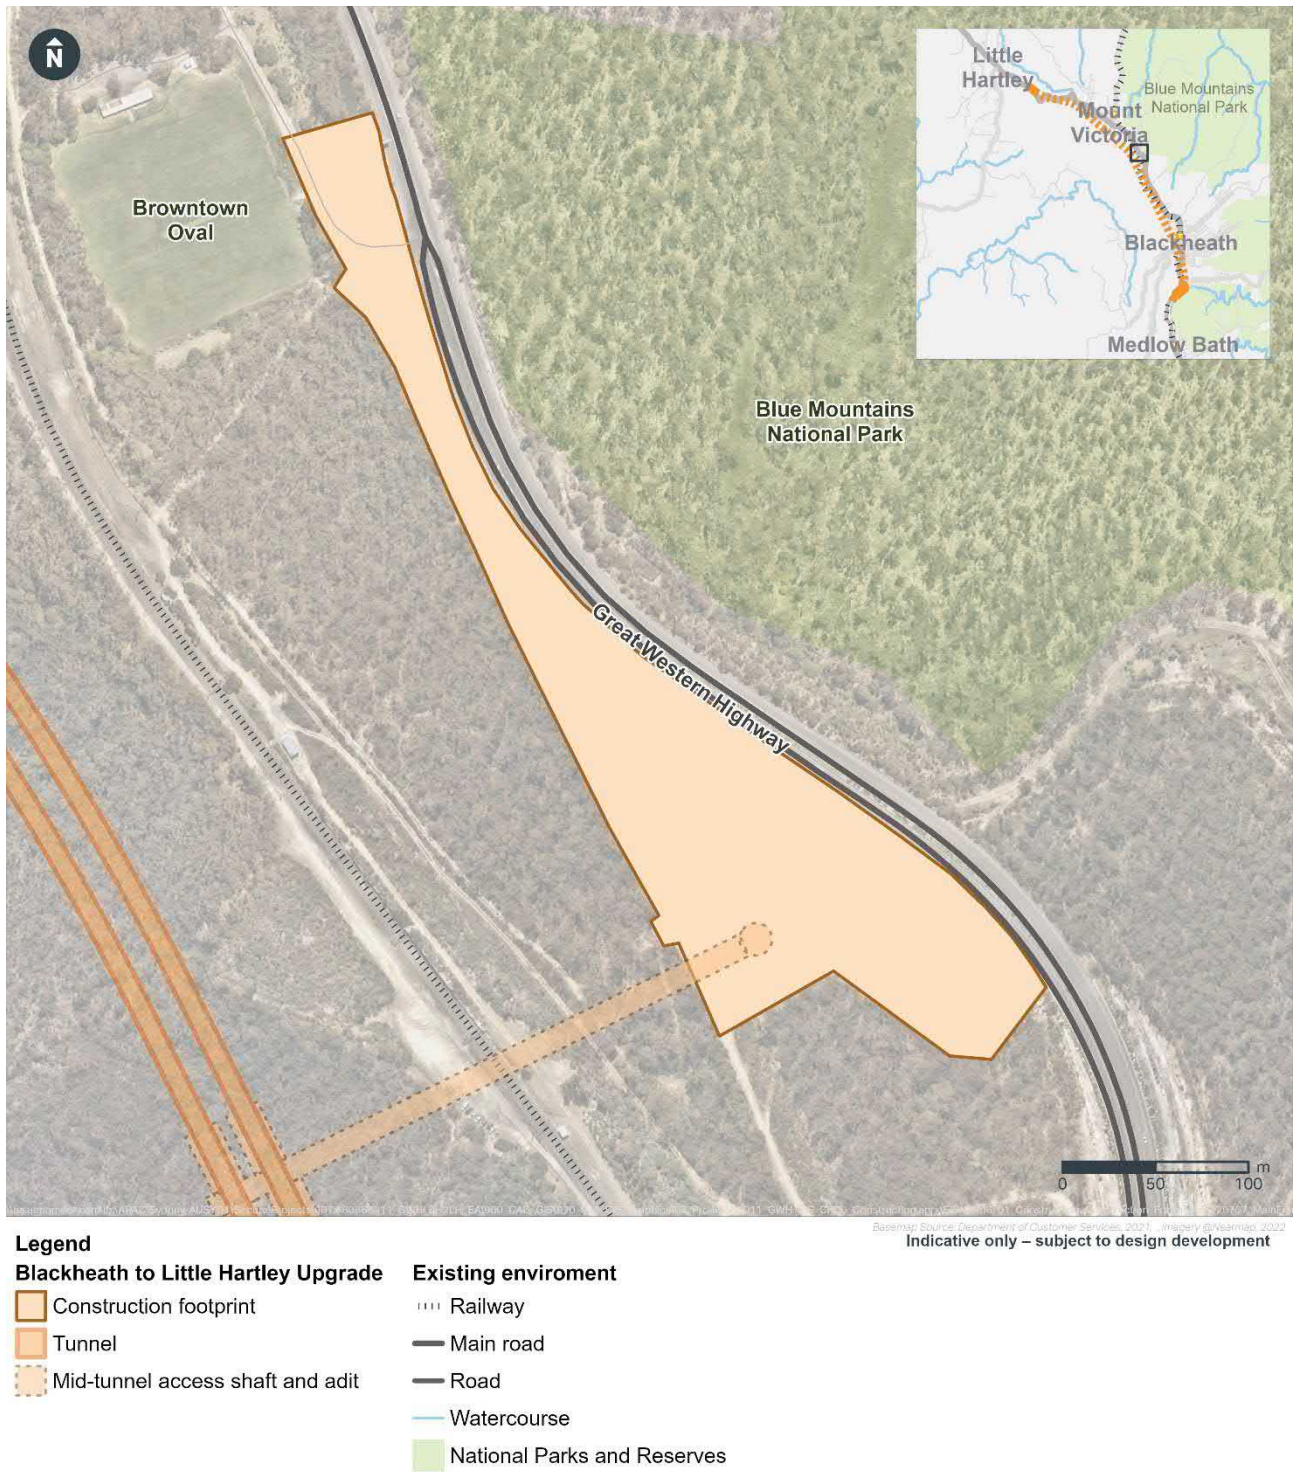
Indicative construction footprint at Soldiers Pinch
